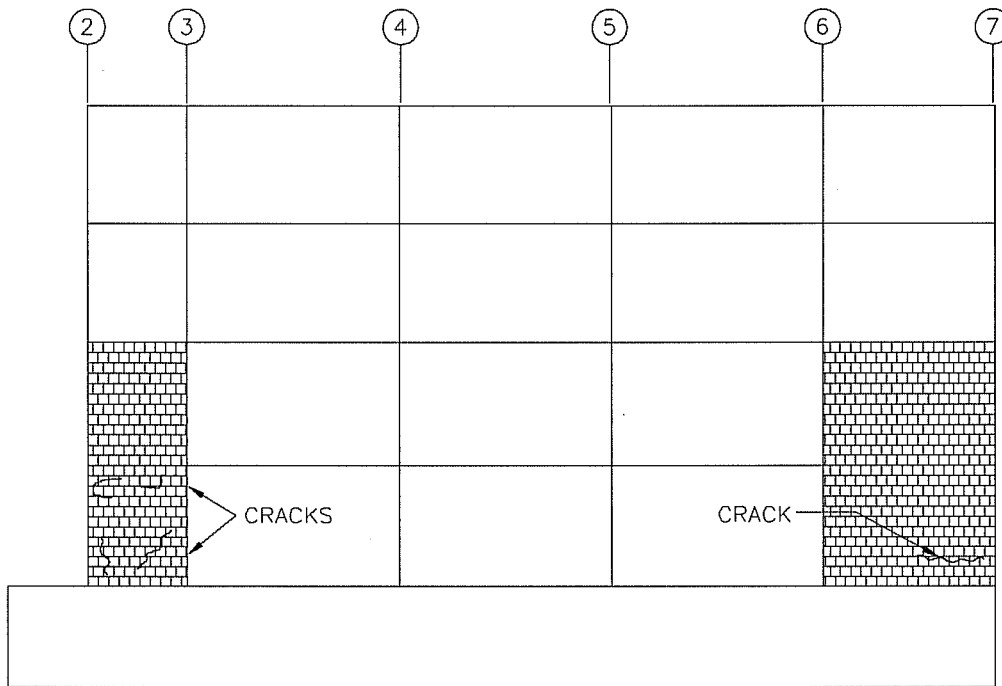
Peninsula Office Building - Observed Cracks in Brick Veneer on the East Wall
